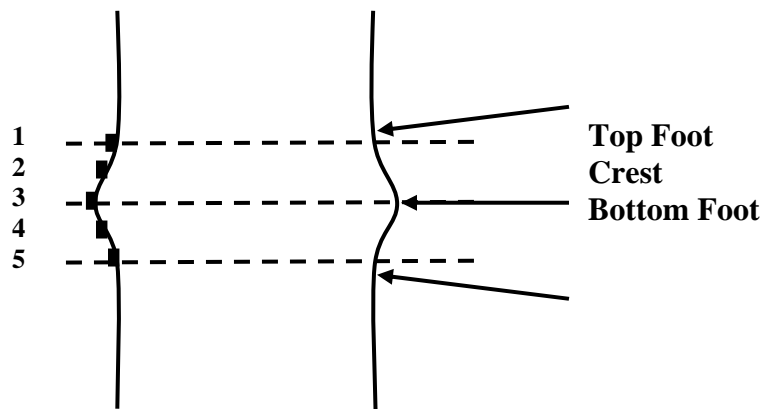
Typical layout of strain gauges in and around the wrinkle for the control specimens
